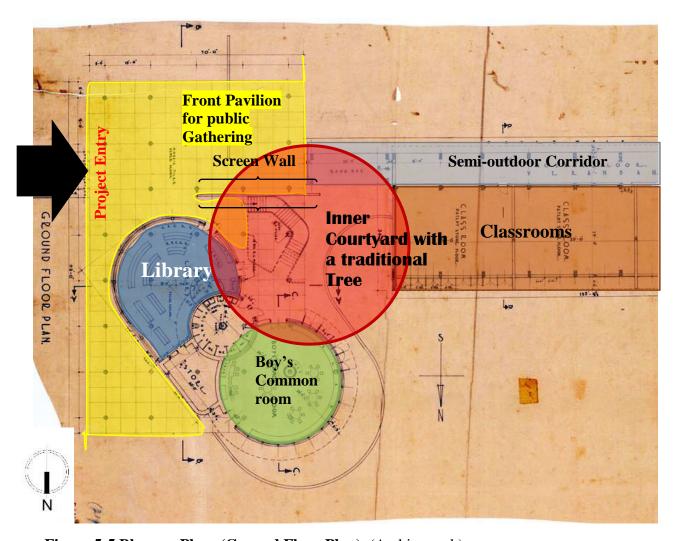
Blow up Plan; (Ground Floor Plan), (Archive, n.d.)
